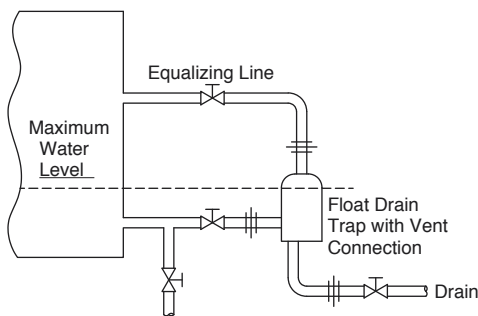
Liquid drainer trap installed at side of a receiver, close to floor. Water will rise to broken line before drain trap opens.
